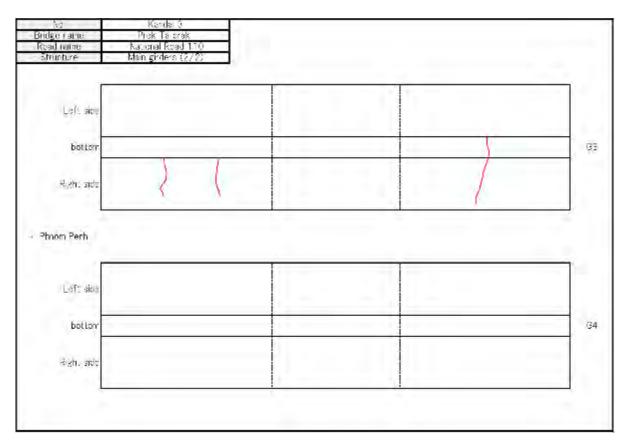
Inspection Sheet (Prek Ta prak: Kandal. Bridge No. 3)
